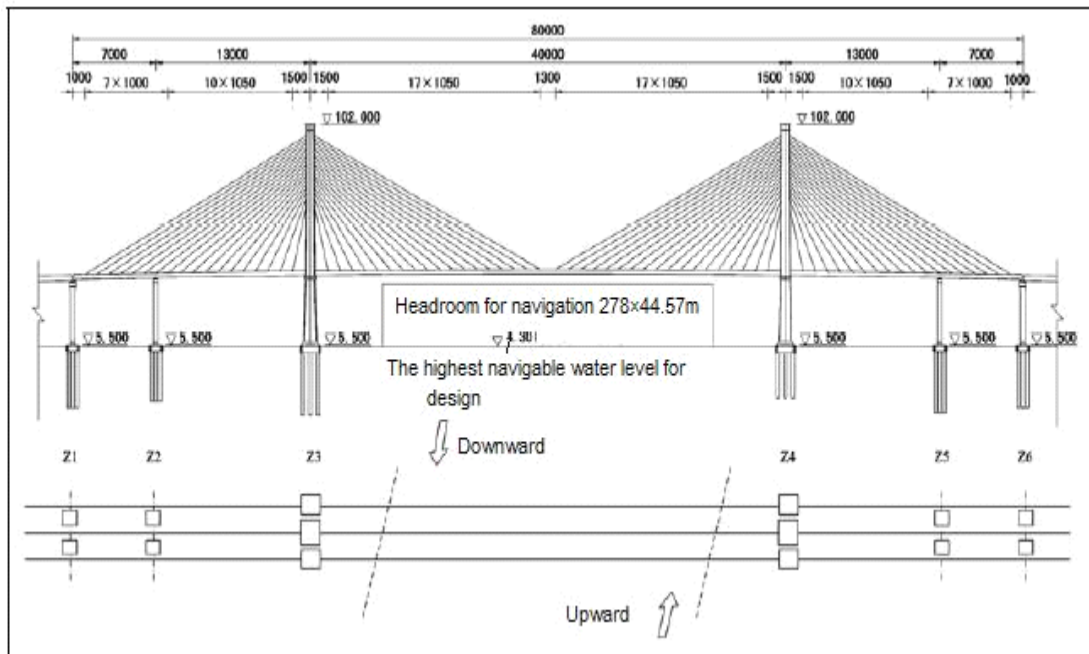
Layout of main navigation bridge type of the Quanzhou Bay Cross-sea Bridge
